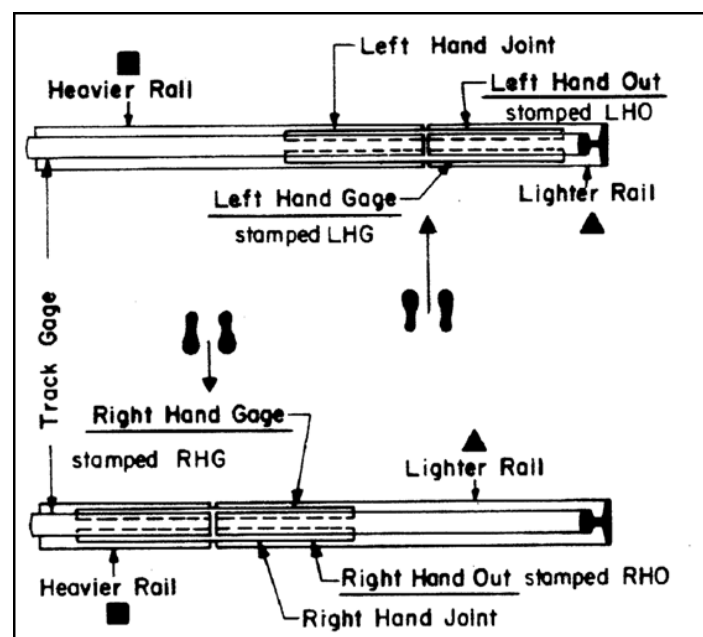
Convention Used to Make Sure Joint Bars are Installed Properly
